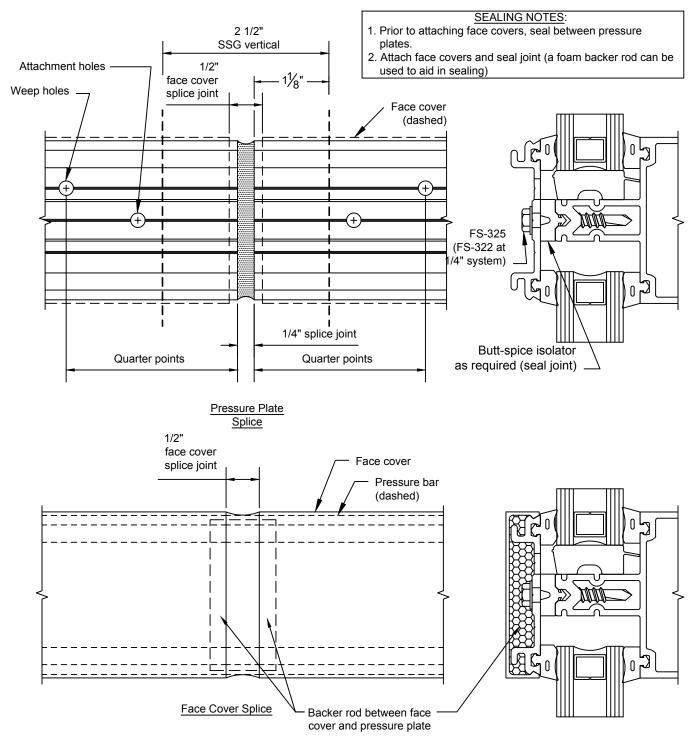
Pressure Plate/Face Cover Splicing & Sealing at SSG Mullions (Intermediate Horizontal Shown; Head & Sill Similar)
